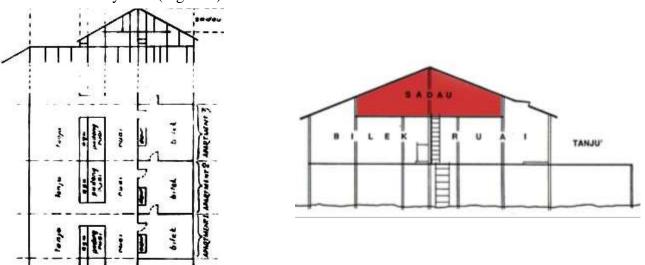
Plan and Section of the traditional Iban longhouse (Anggat 2010).
